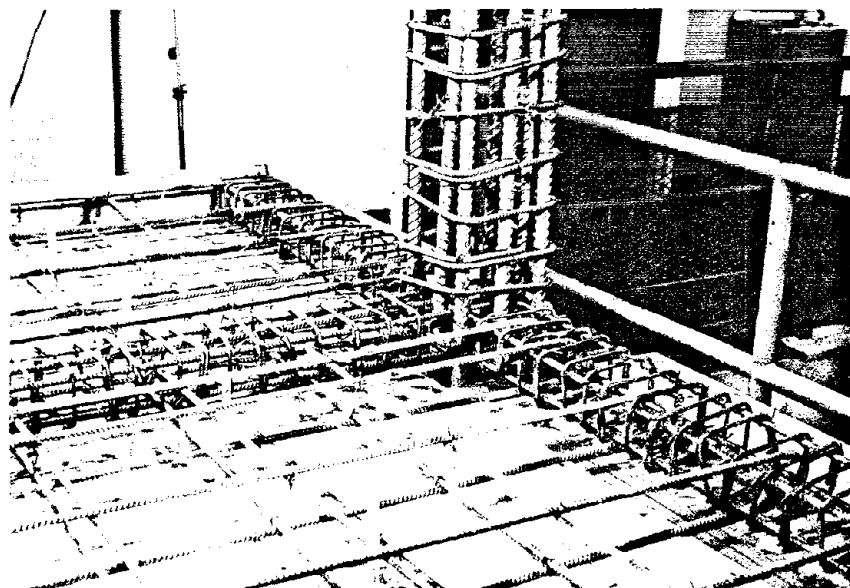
Specimen 4S - Exterior connection reinforcement
